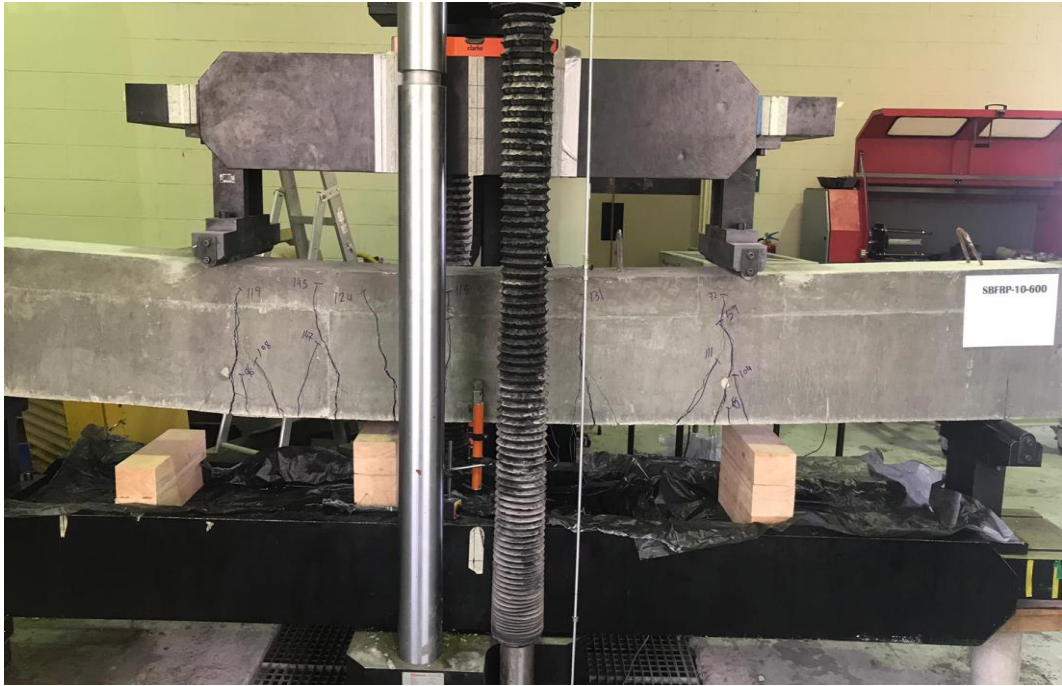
Cracking pattern of beam 2 (SBFRP-10-600)
